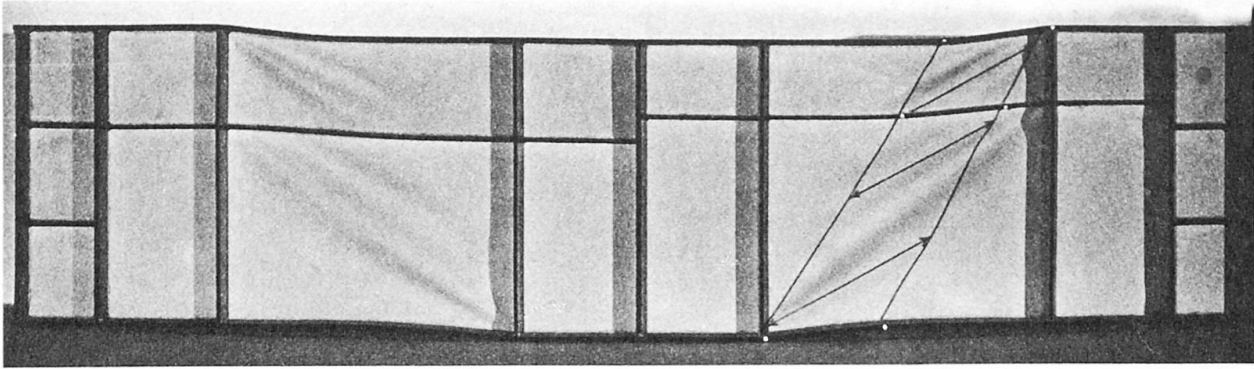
Illustration of failure mechanism developed in longitudinally stiffened girders.
